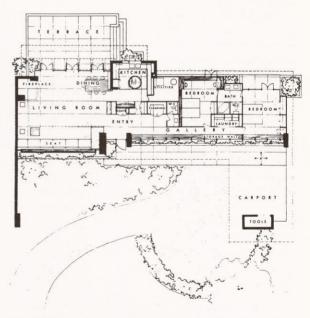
Guggenheim Exhibition House: Floor Plan. © 1955 FLWright Fdn, 5314.018.
